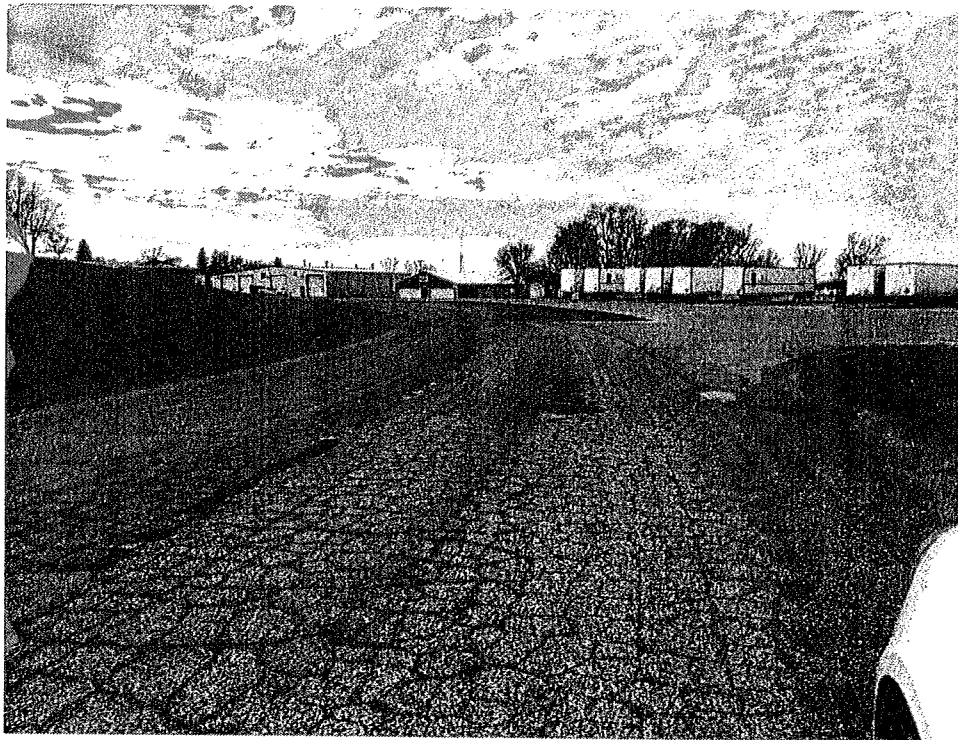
Looking southwest along Ridge Drive at the W&A Facilities
